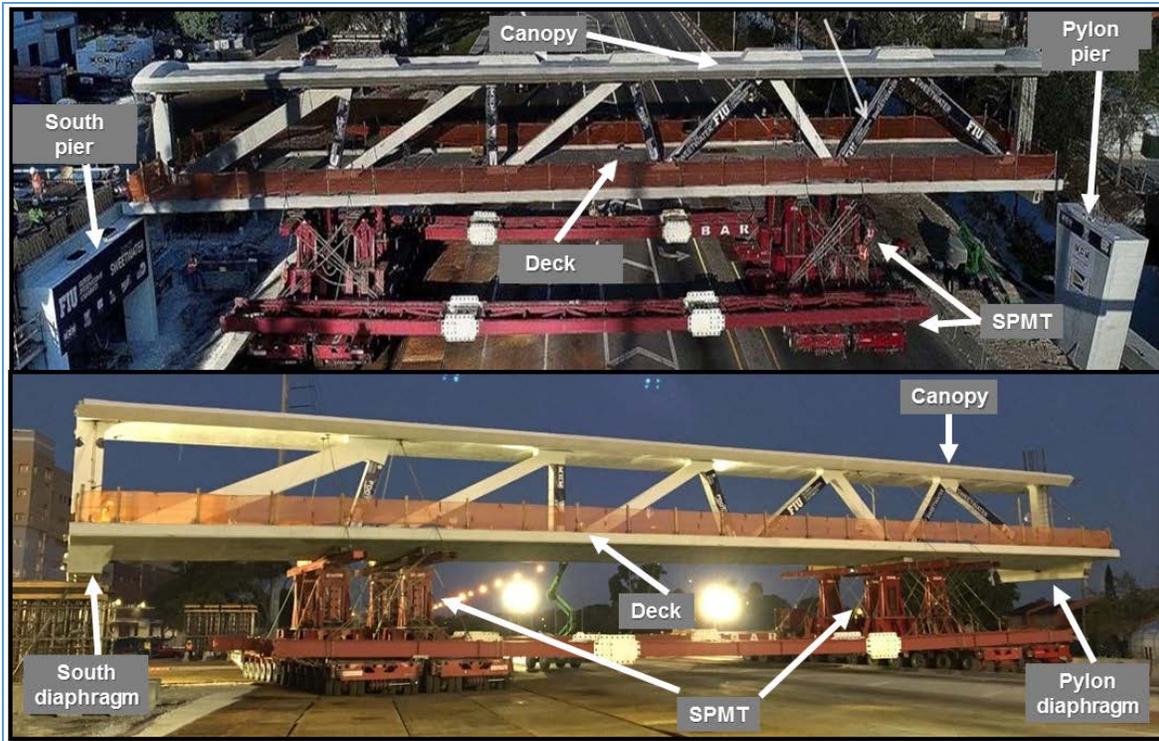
SPMT being moved overnight on March 10 (bottom) and main span being placed on south and pylon piers, facing west (top). Transport occurred over 8 hours, starting at 4:30 a.m., with placement of final permanent pier support concluding at 12:30 p.m. (Source: FIGG, annotated by NTSB)
